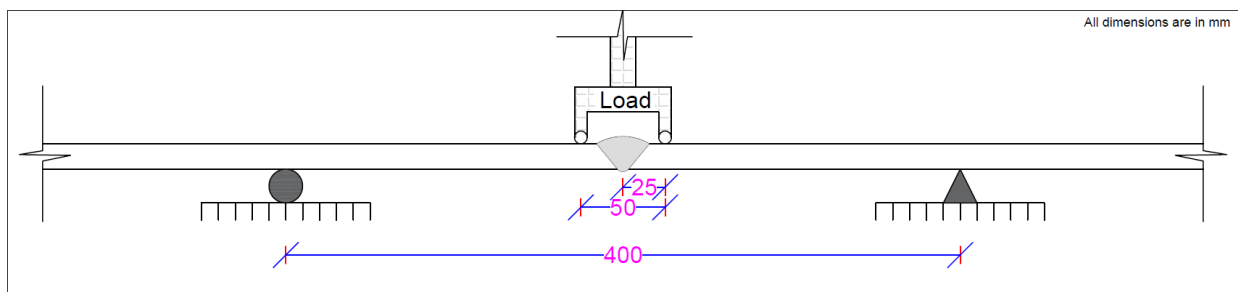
Sketch of the dimensions to supports and loading cell for the four-point test
